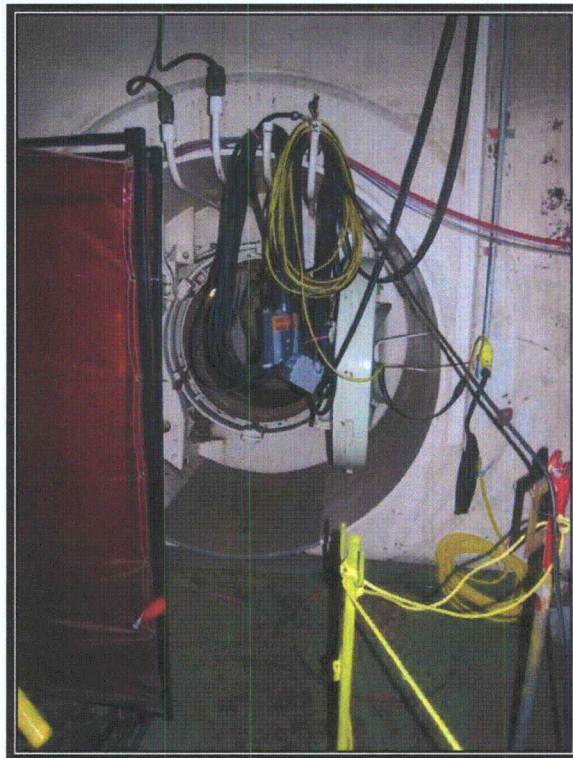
Emergency egress hatch (Photograph by RCG&A, 2008)
